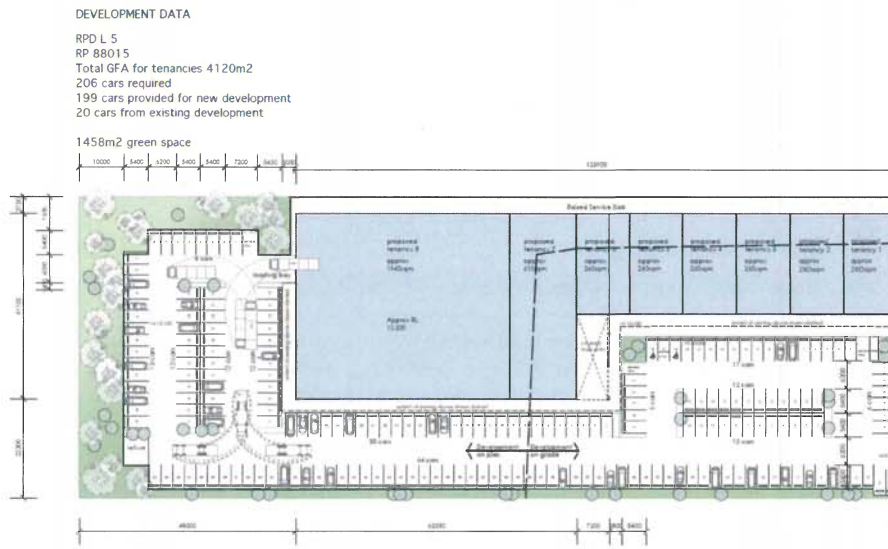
Submitted Development Plan 134 Morayfield Road Caboolture South
